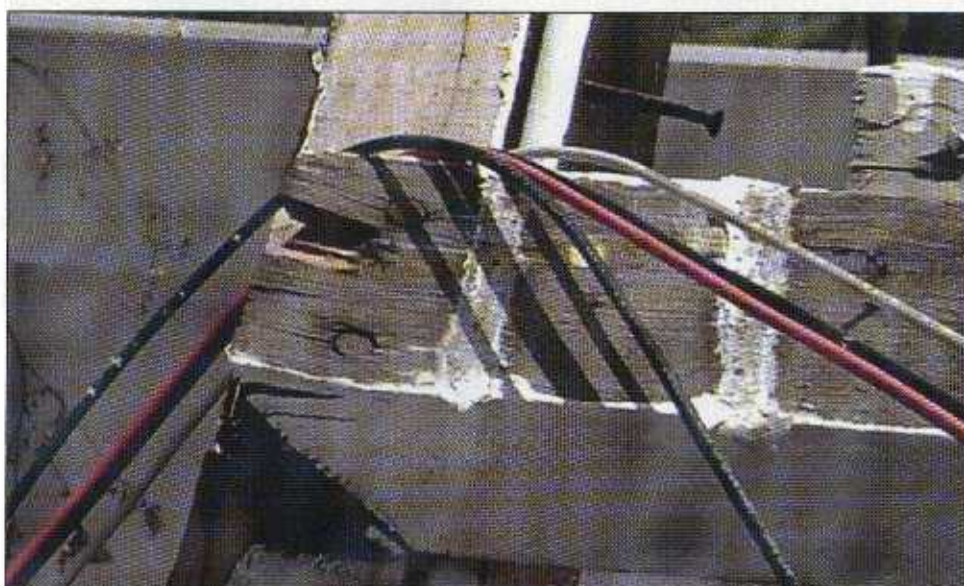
Nailed roof structure connection from church in Figure 4-9.
